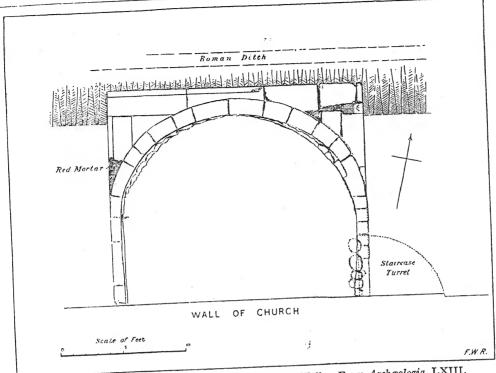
Plan of Bastion at All Hallows, London Wall. From Archæologia, LXIII.
